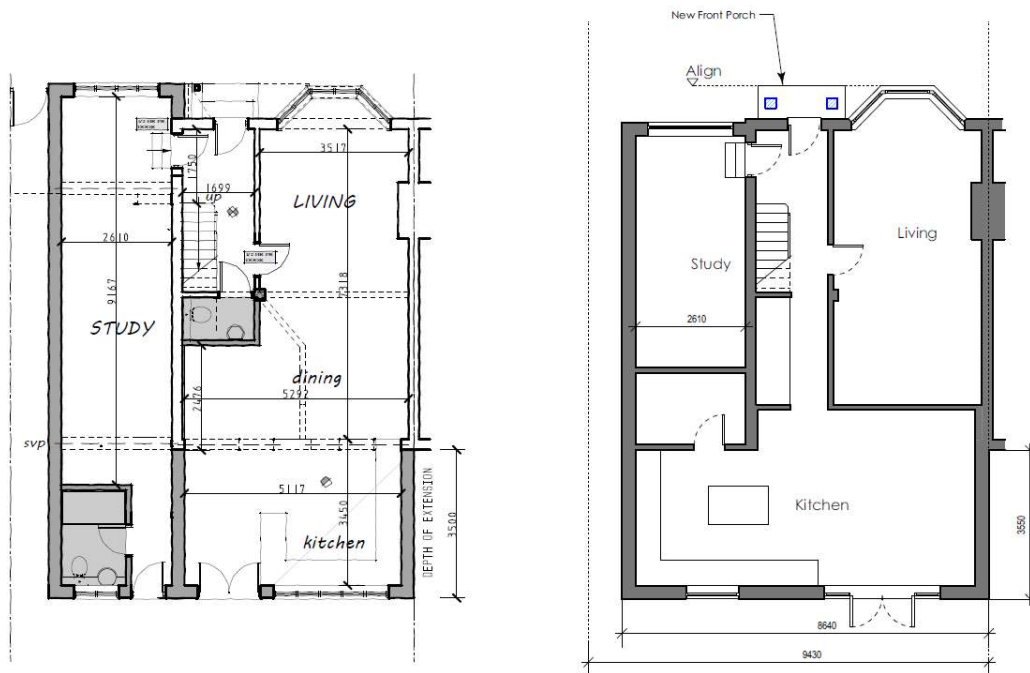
Previously approved ground floor plan (left) and proposed ground floor plan (right)
